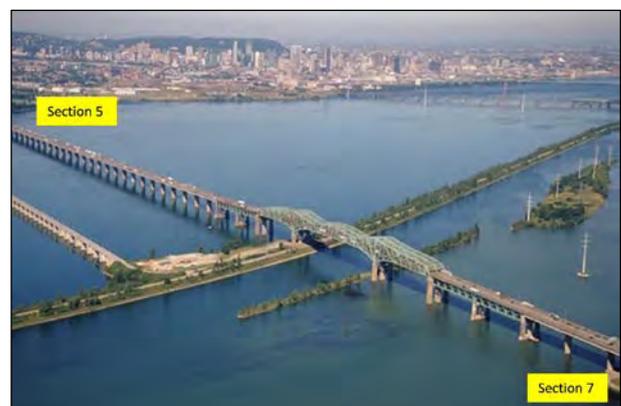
Photograph of the Champlain Bridge, main spans and approaches (Section 5 and 7)
